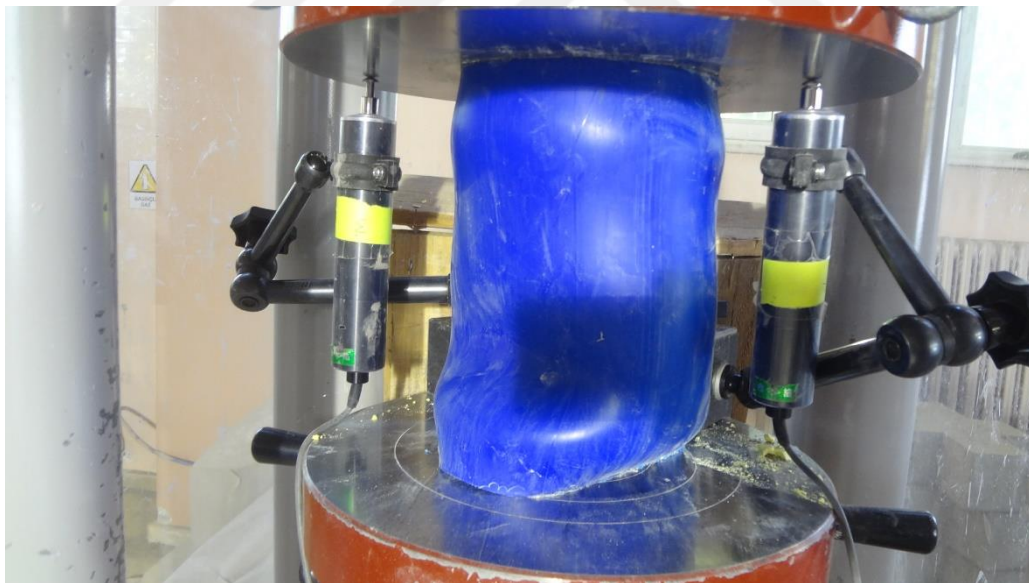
HDPE tube (H-G1-W) step 4 for the test
